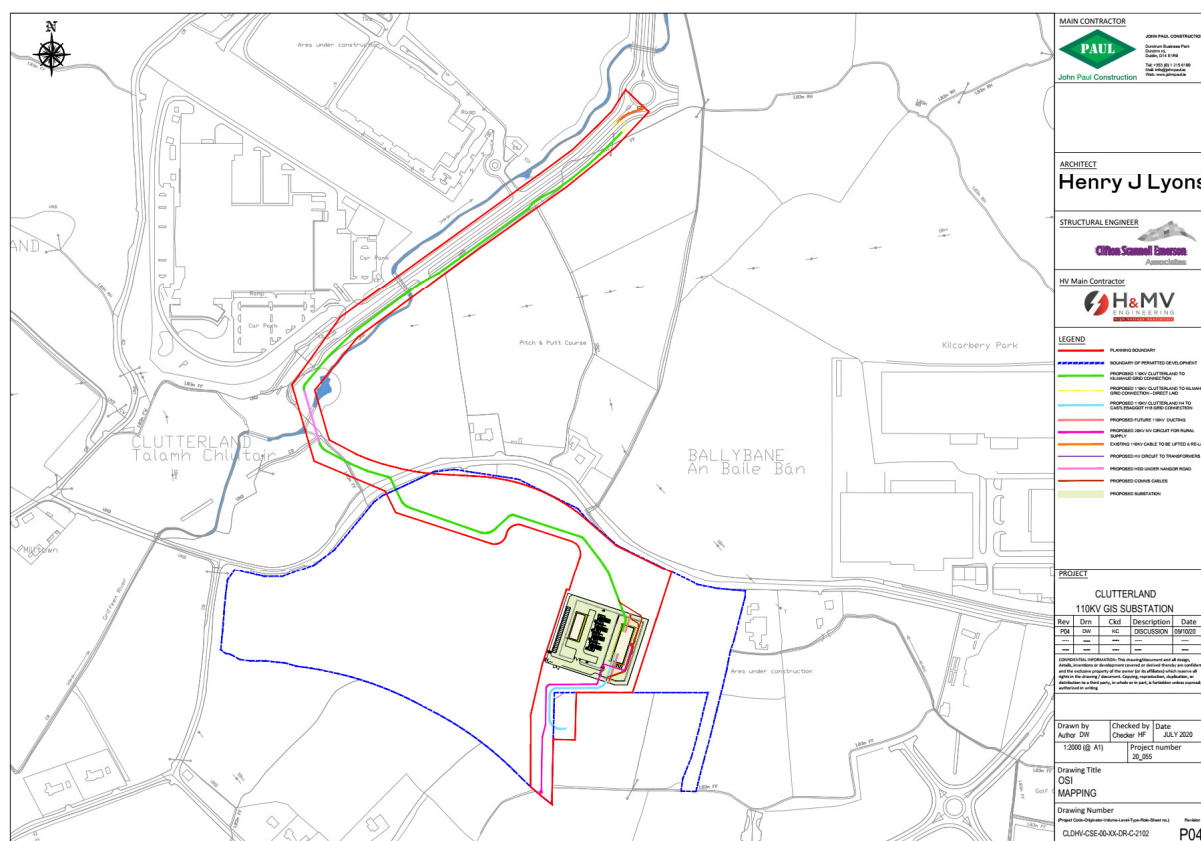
Proposed site layout plan of the Proposed Development site (red line) indicating proposed 110kV transmission lines (green and cyan line), 49kVa supply cable line (pink line) as well as the permitted development site (dashed blue outline) (Source: Drawing no. CLDHV-CSE-00-XX-DR-C-2102, CSEA)
